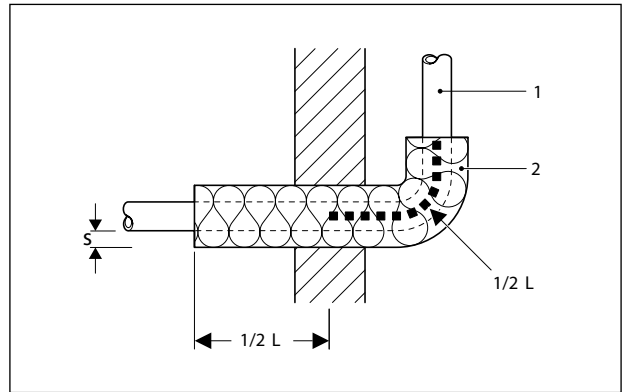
Fire protection Geberit Mepla  $\varnothing$  16 - 75mm: Wall penetration, solid wall, bend
